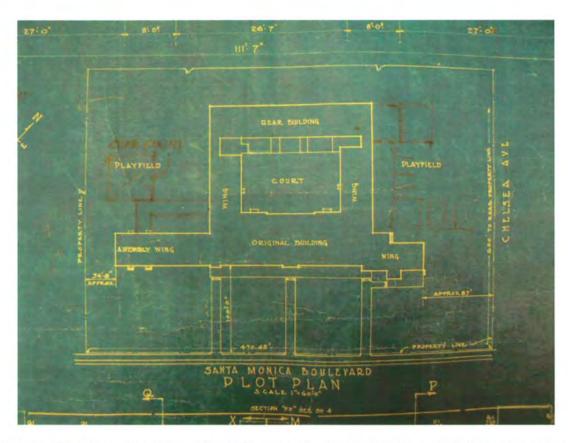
Plot Plan, McKinley School, Showing the Original U-Shaped Building by Allison & Allison, with the Addition of a New Rear Building and Side Wings by Parkinson & Parkinson, 1935.
